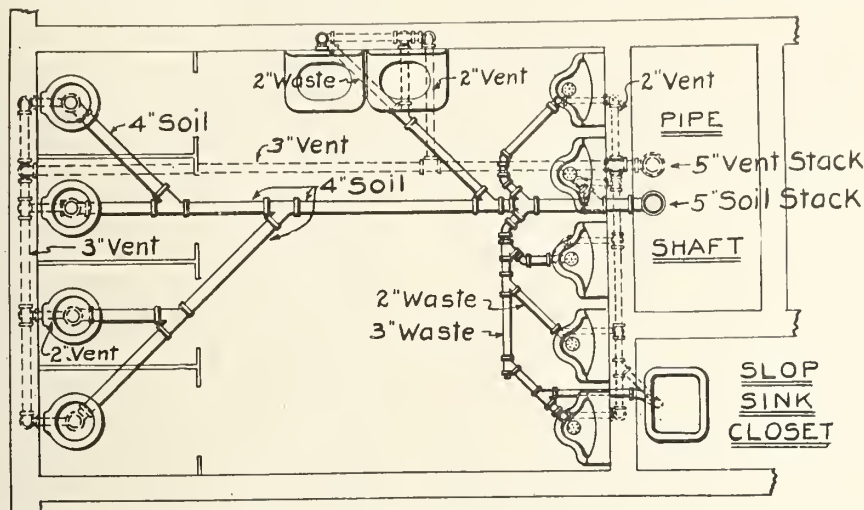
Plan of the Typical Toilets, Showing Location of Fixtures and Piping Arrangement in the Æolian Building.
